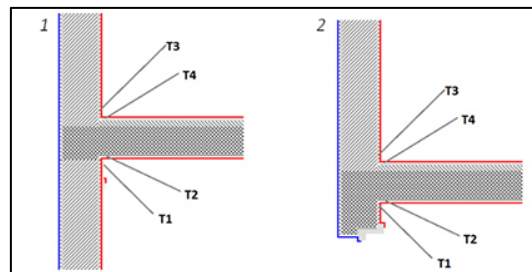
Characteristic points on the wall-floor connection – Model 1 (left) and Model 2 (right)
